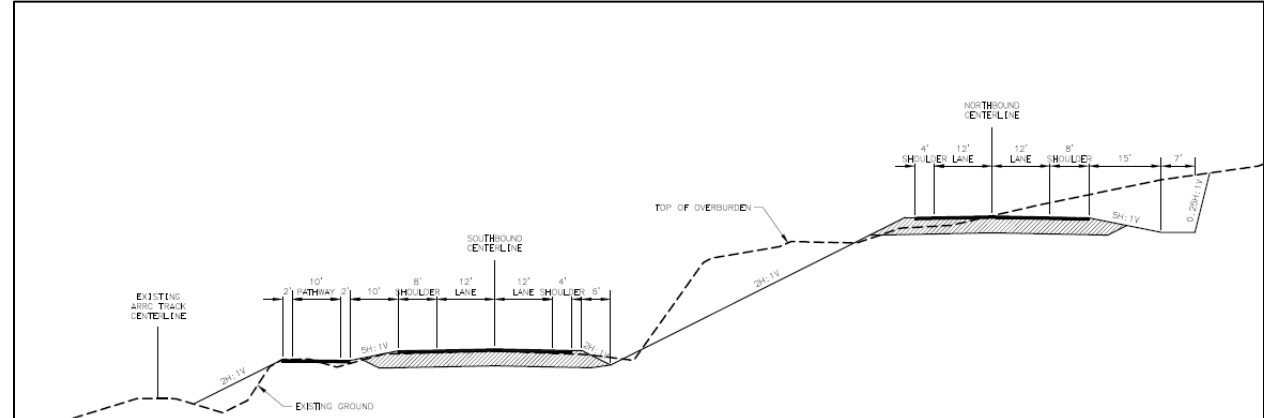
Four-lane, median-divided highway conceptual cross section.
